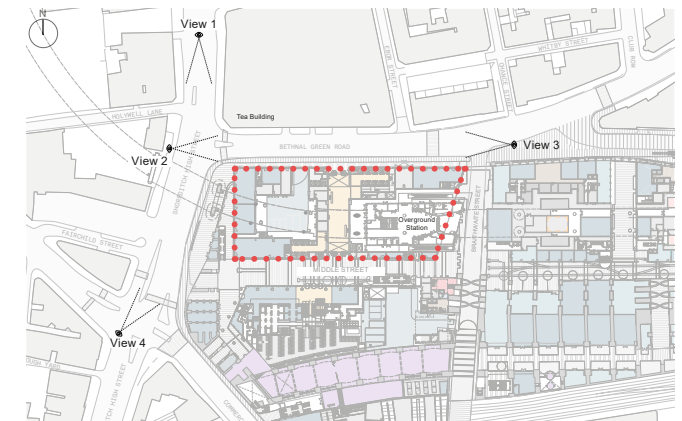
Plot 1 proposed GF plan and context views key.
